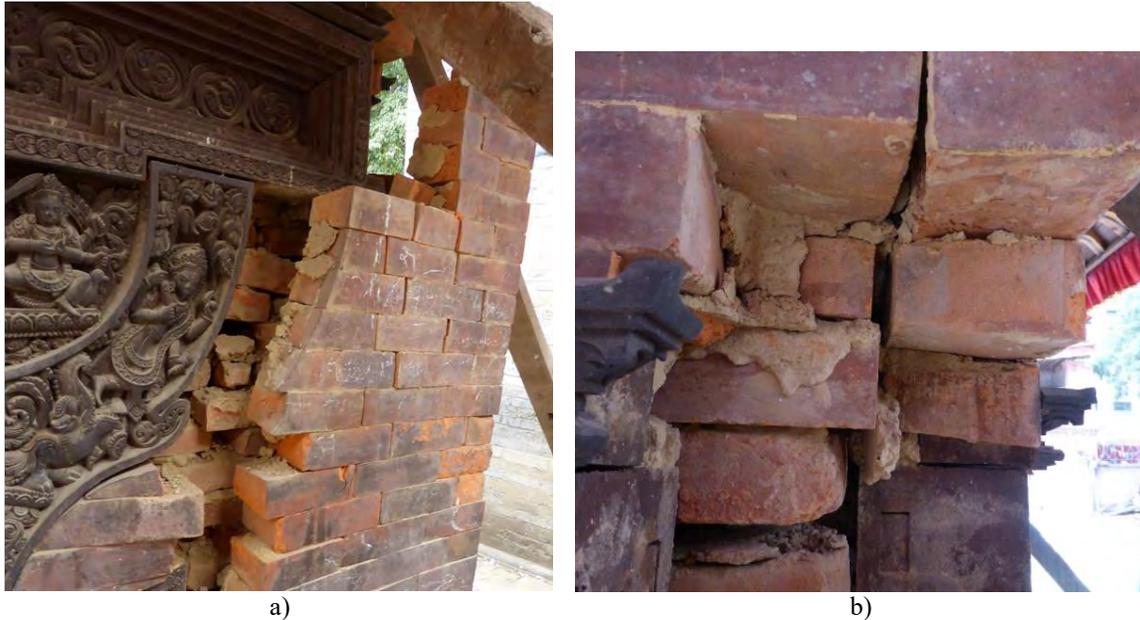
Damaged masonry wall in the temple shown in Figure 8.20: a) the separation of the exterior wall wythe and b) a detail showing an absence of the corner connection between interior wall wythes (S. Brzev)
